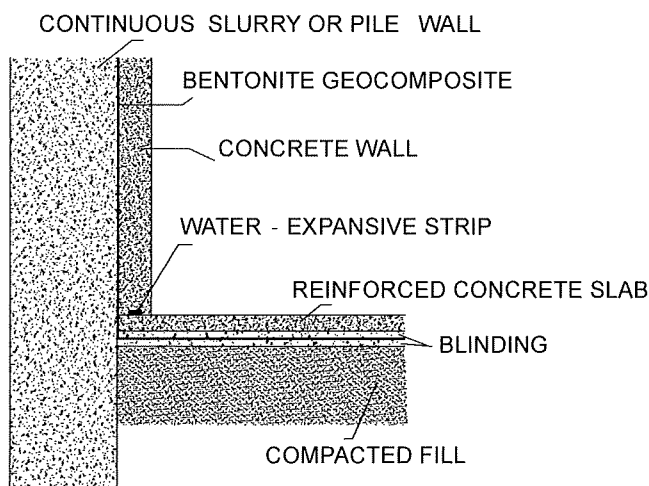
Standard cross-section of a tunnel inside slurry walls, with bentonite geocomposites and strips
